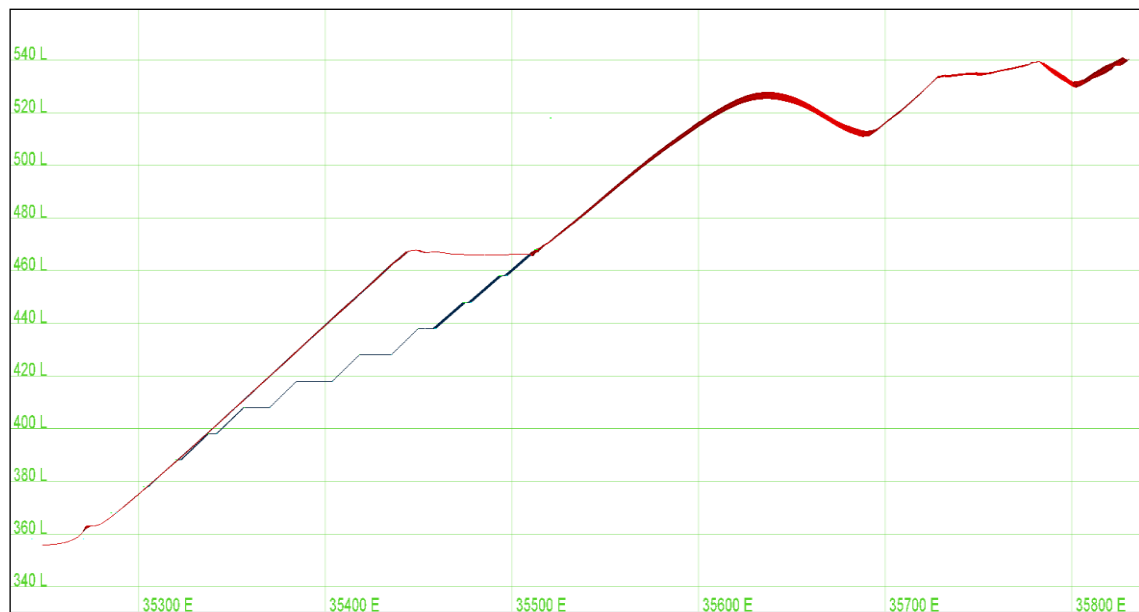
38. The cross sectional showing bench layout (Entire tailing resource)
